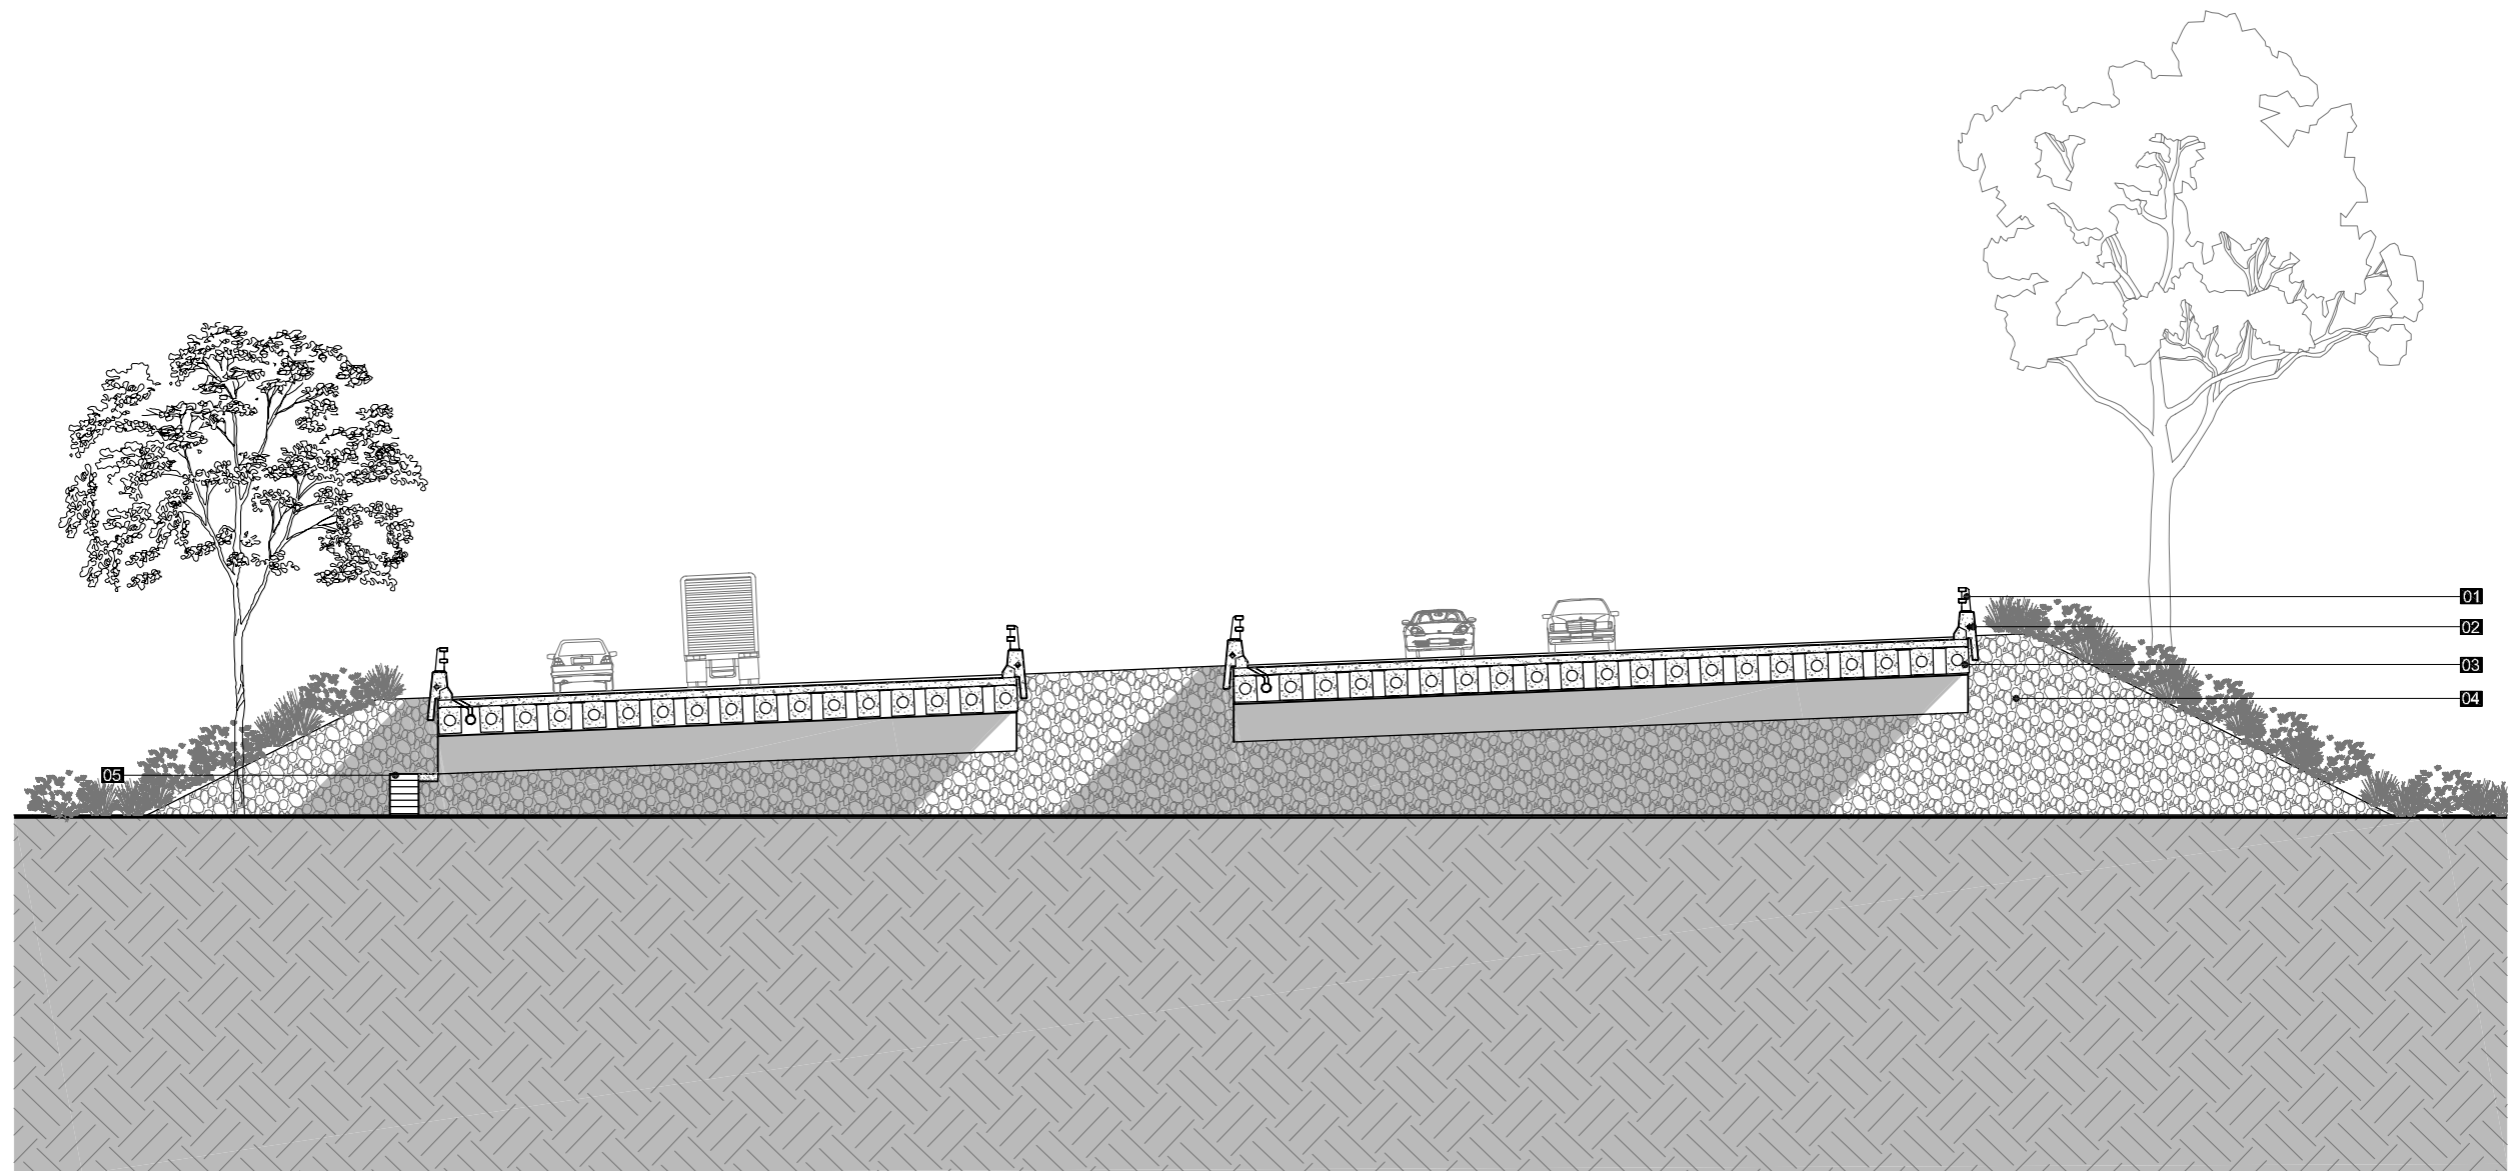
Twin Bridges over Flow Balancing Water Course and Fauna Crossing: Elevation
